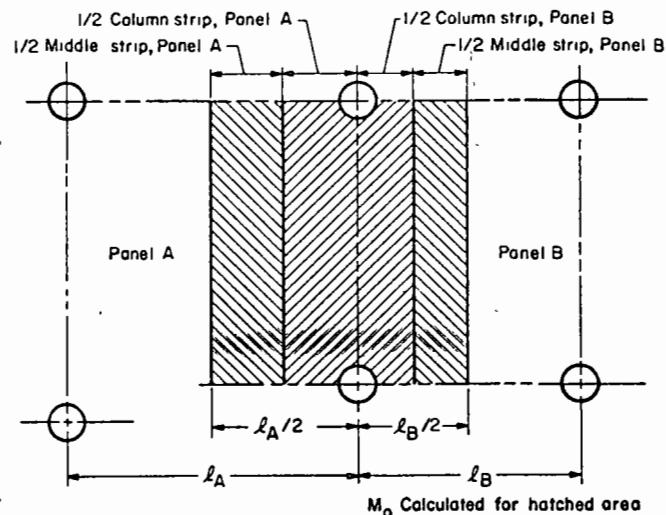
Suggested area to be considered in calculating static moments under Section 13.3.2.1
